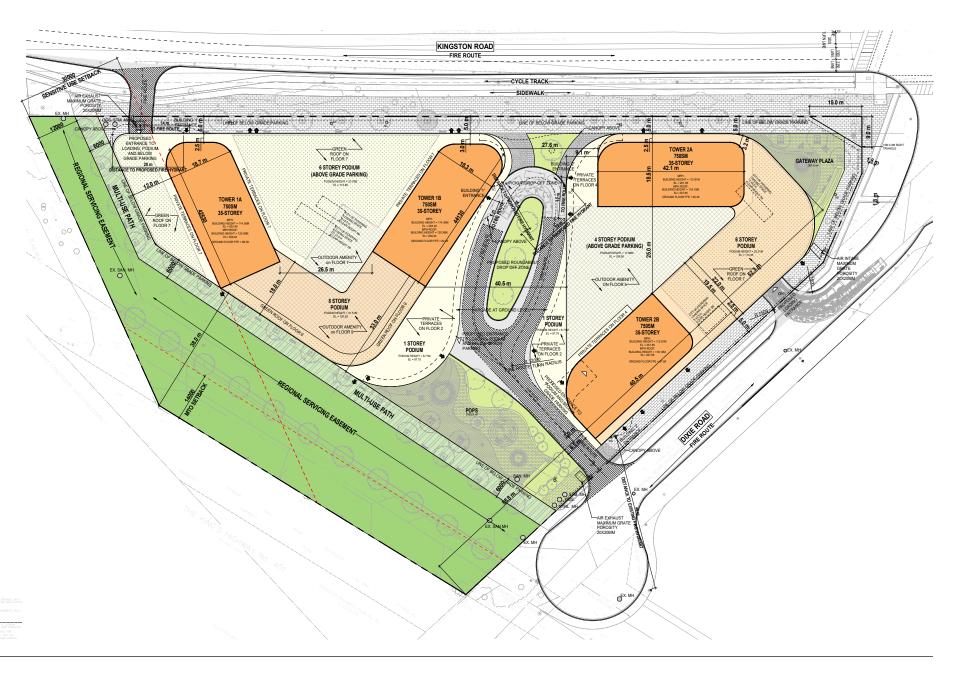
Site Plan (BDP. QUADRANGLE ARCHITECTS LTD.)
